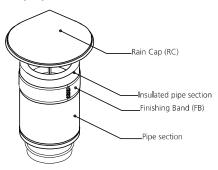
Finished assembly for Rain Cap (RC) and Exhaust Cone (EC)
